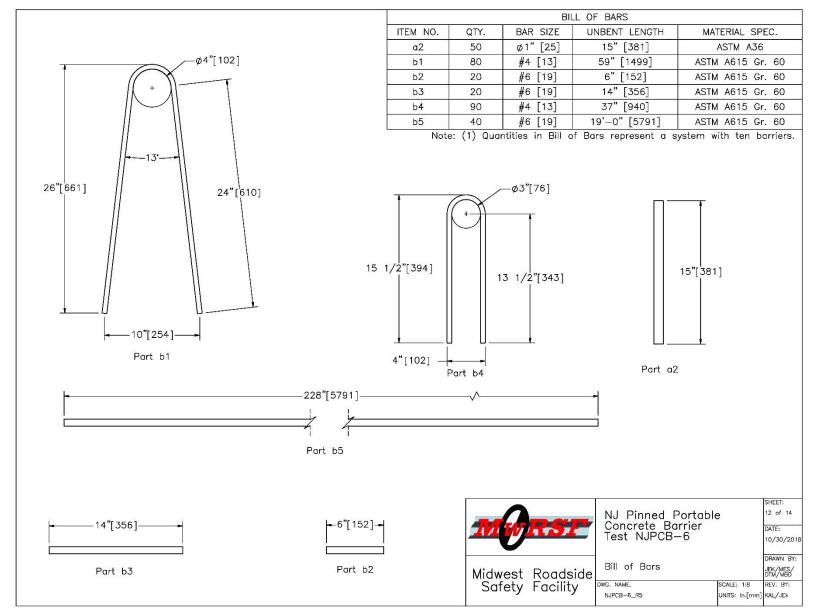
PCB Reinforcement Details, Test No. NJPCB-6
